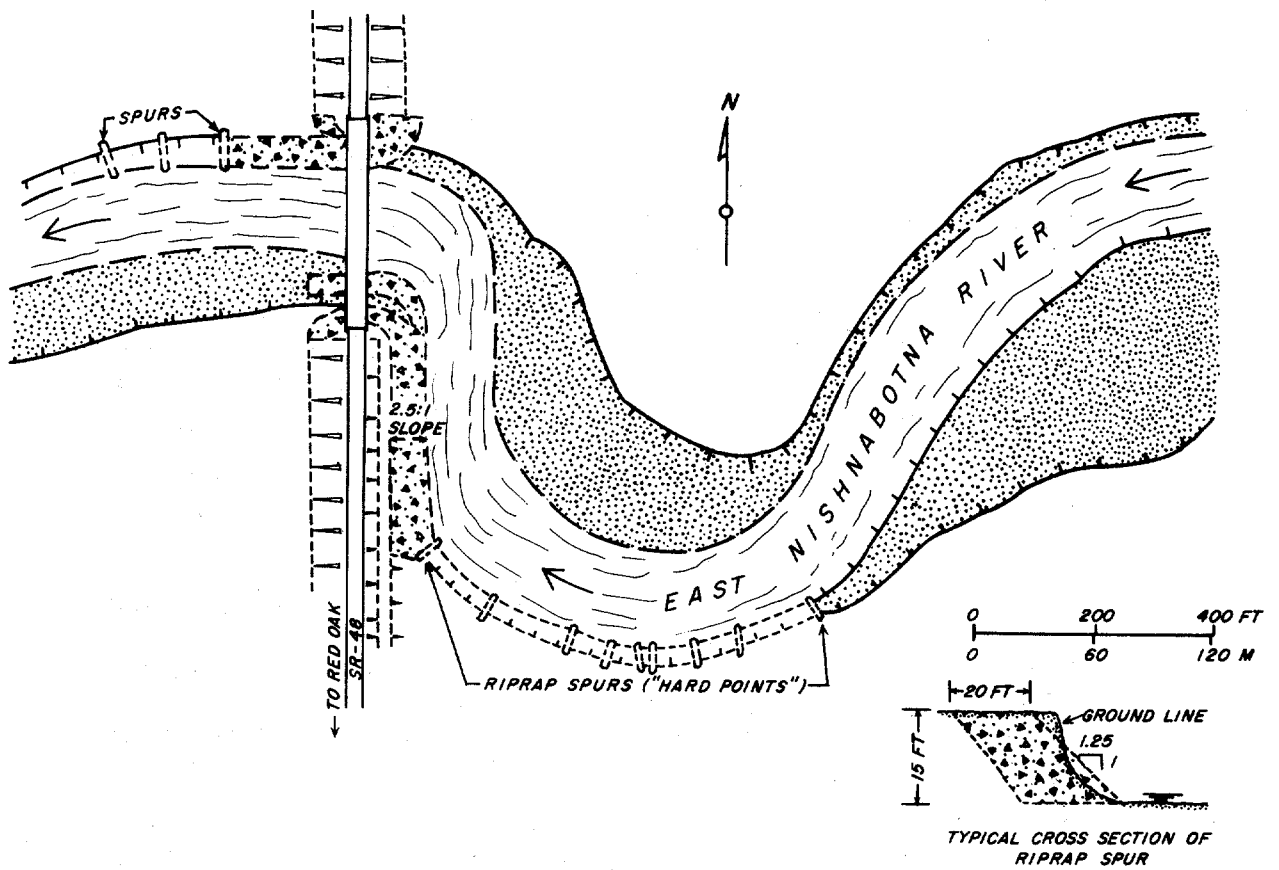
Plan sketch of countermeasures installed at time of bridge construction, East Nishnabotna River at SR-48.
